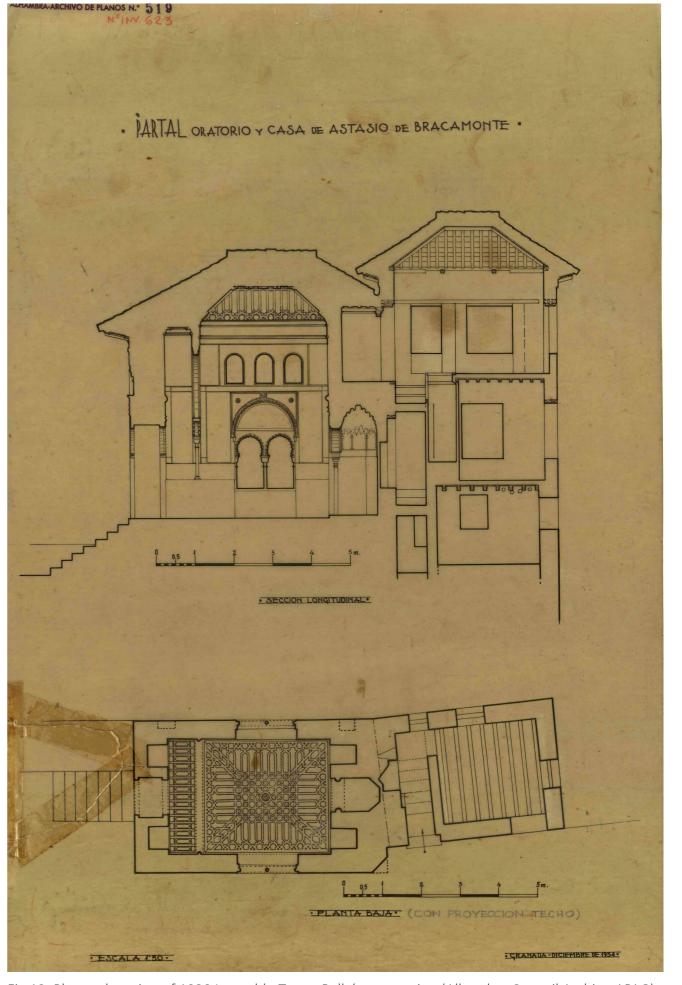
Plan and section of 1930 Leopoldo Torres Balbás restoration (Alhambra Council Archive-APAG)
